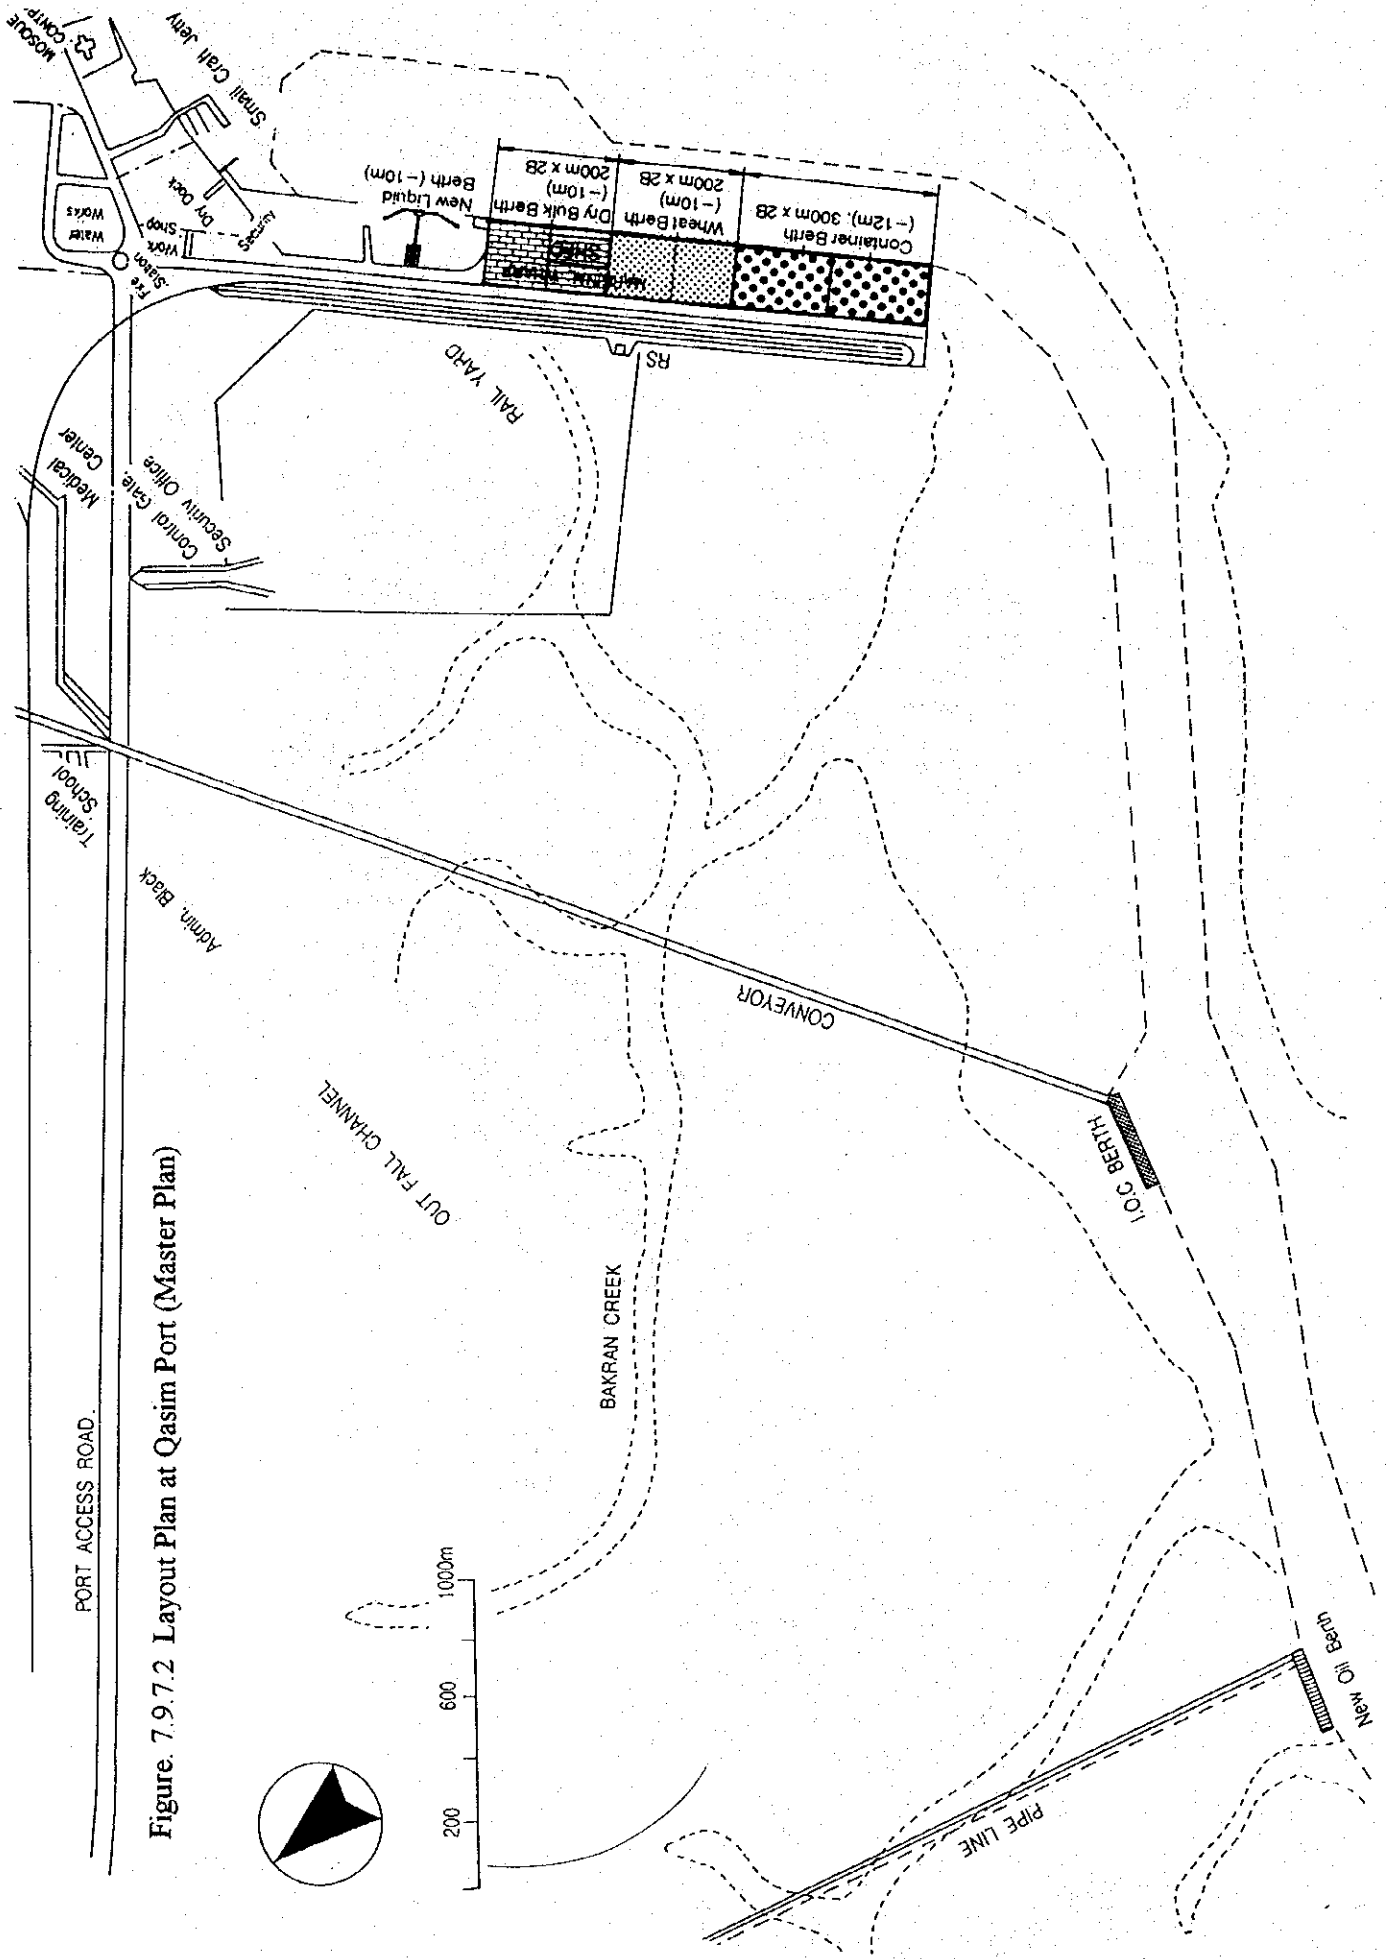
Layout Plan at Qasim Port (Master Plan)
